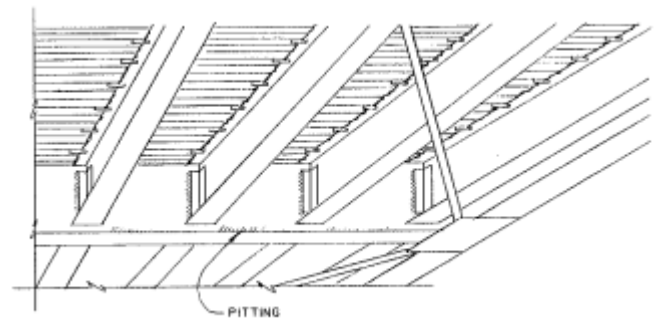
Pitting corrosion attack the girder lateral connection and stringer bottom [2]
